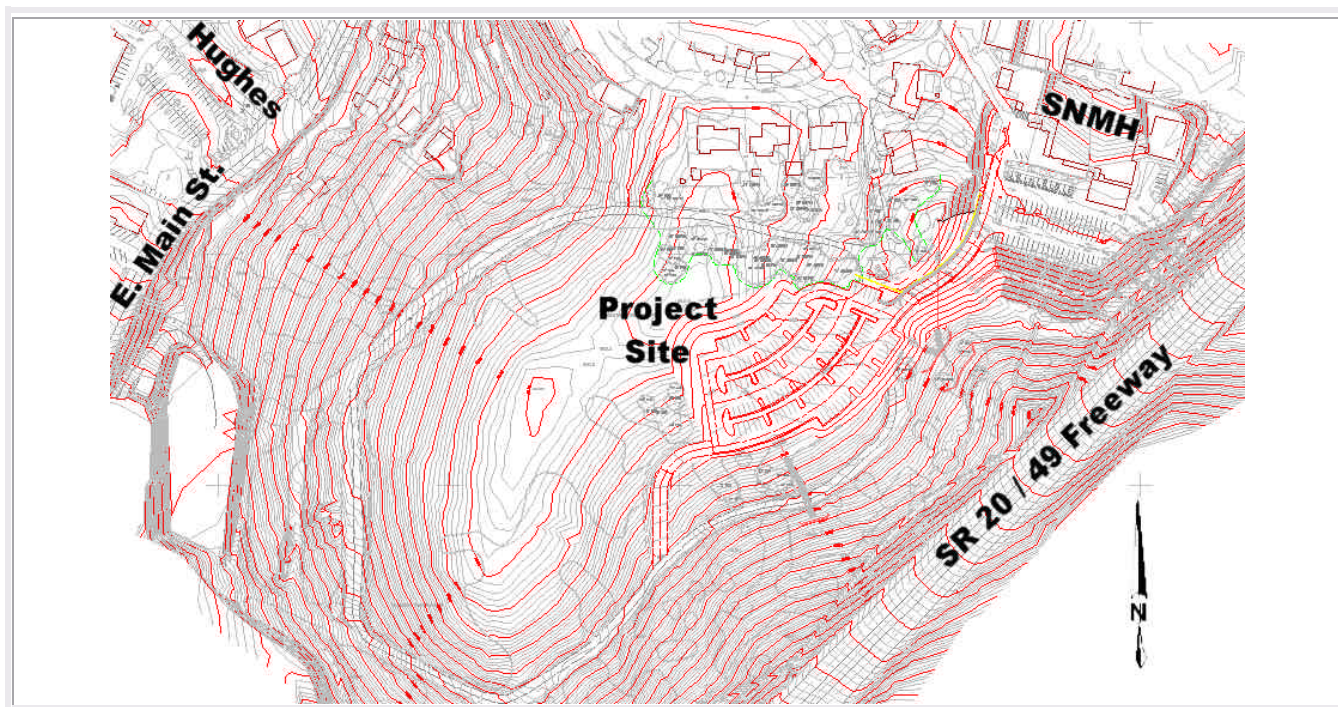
B Existing Parking Lot and Land Topography DetailEXISTING SETTING
